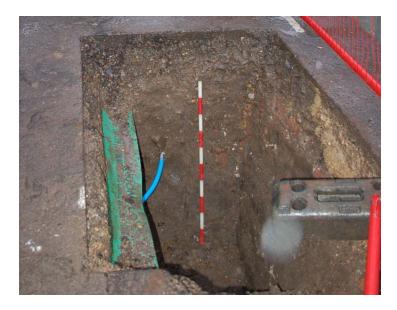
Section of trenching on Haverstock Road showing up-cast deposits from coal-cellar construction (1m scale).
